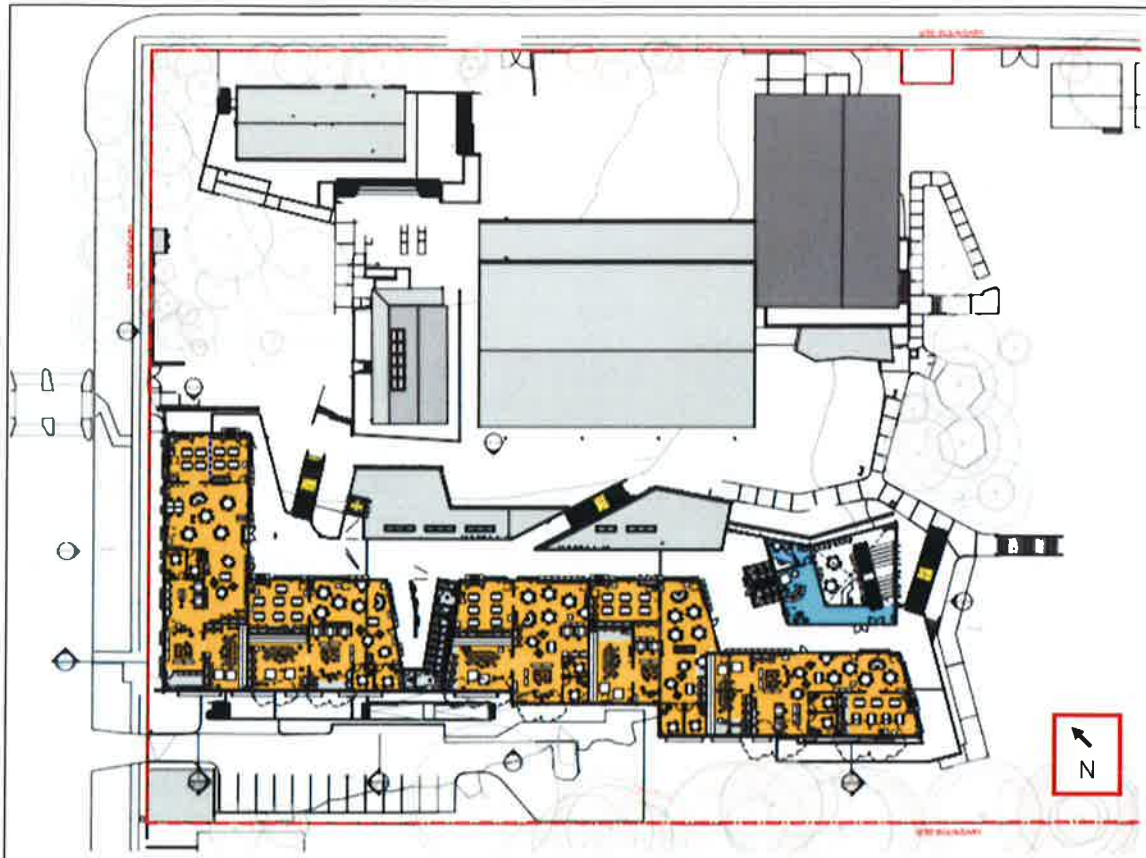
| Approved First Floor Plan (Base source: SSD-8740 Application 2018)
